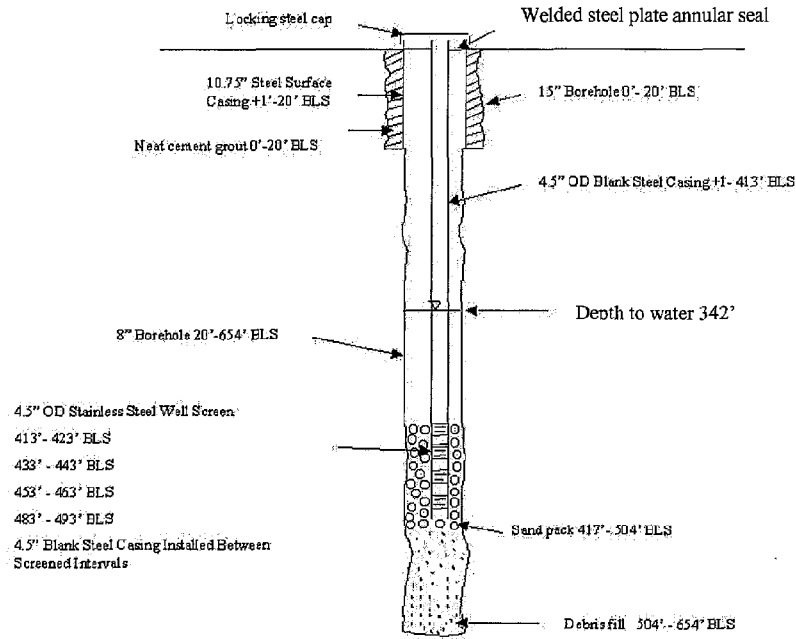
As-built well construction drawing for B(16-1) 23ACA
